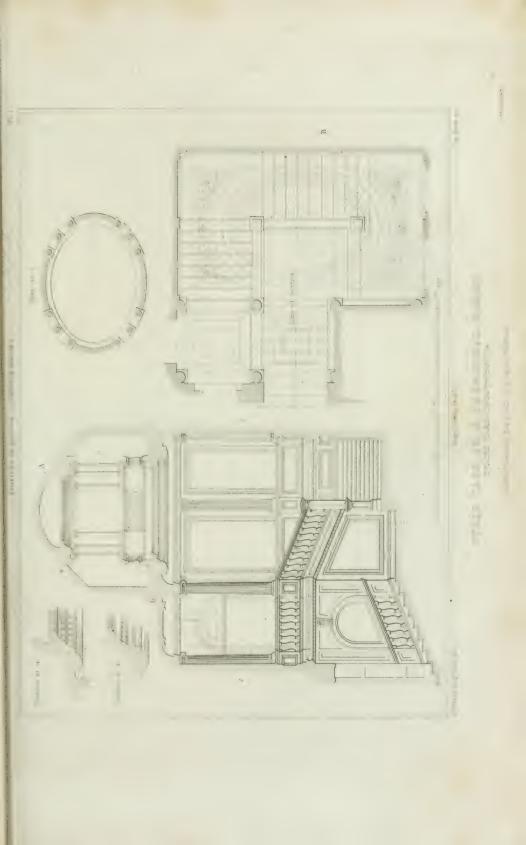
PLATE I.—A. Section of the staircase, in a line indicated by dots on the plan, B; whilst C shews the plan of the gallery, under the dome. The small letters of reference indicate the situation and forms of some of the mouldings, &c., to a larger scale.
